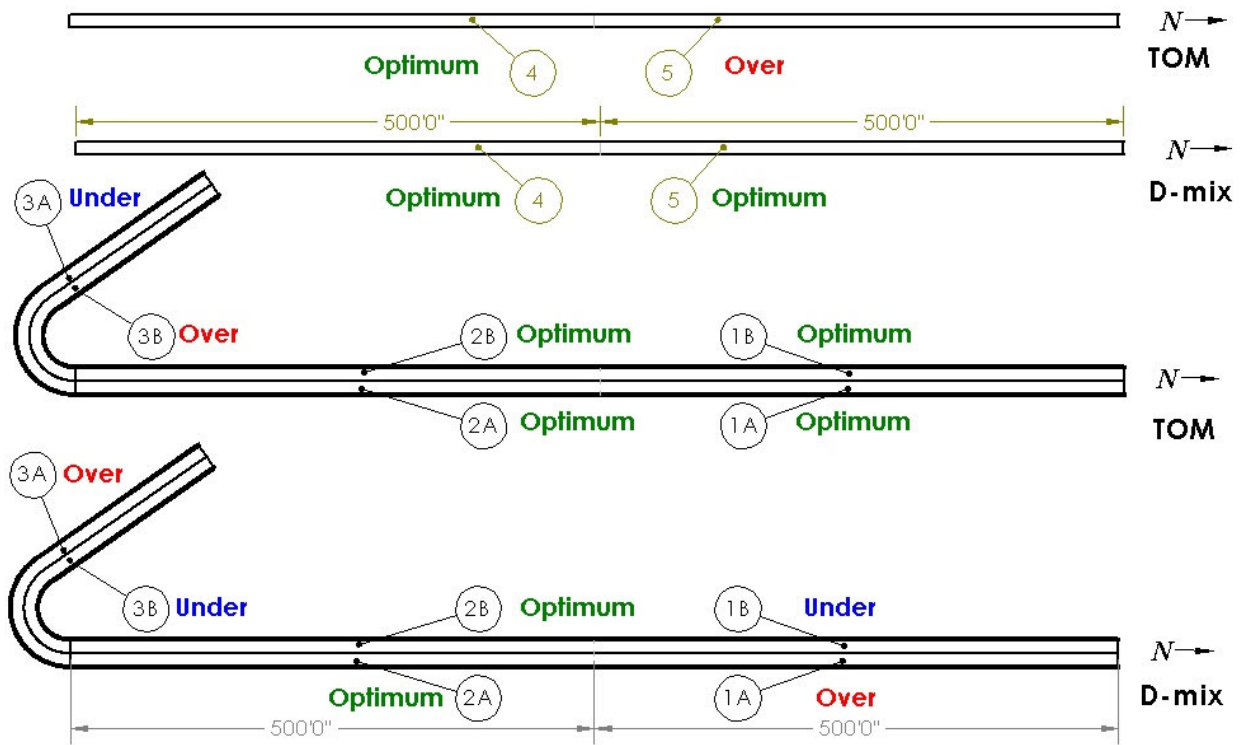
Schematic Layout for Test Section and Compaction Level for Each Section.
